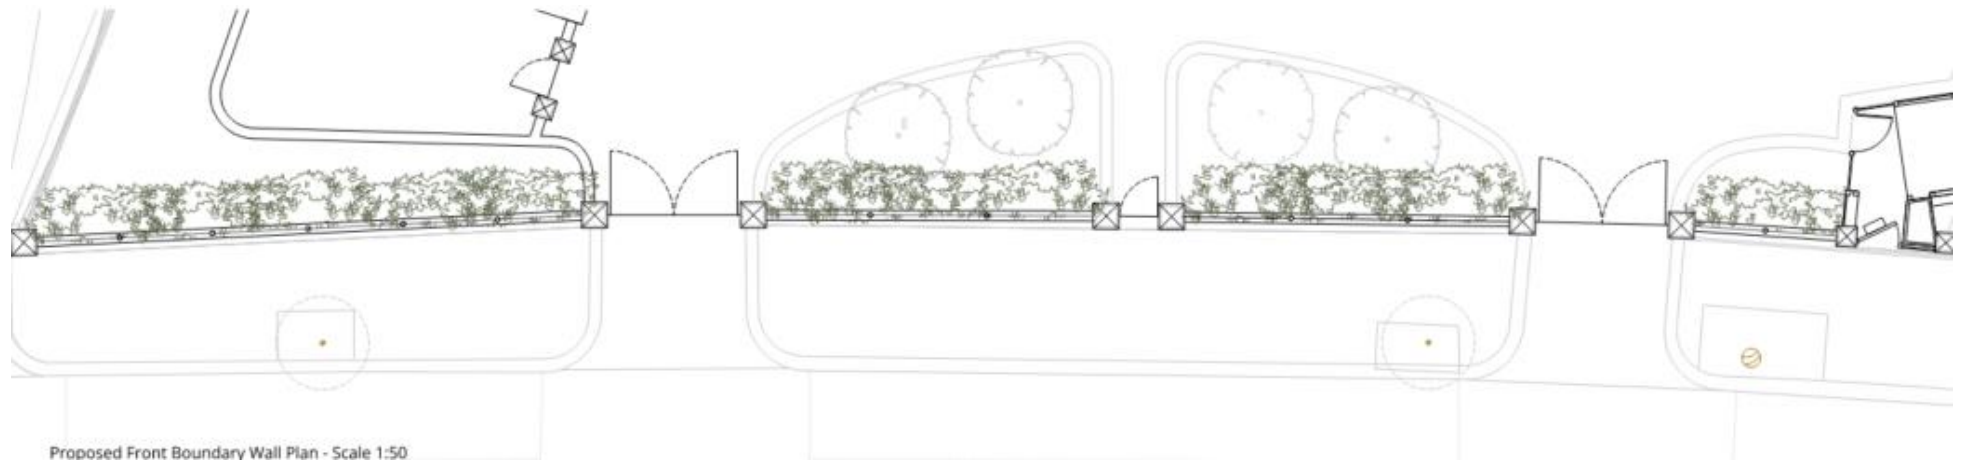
Proposed front boundary wall plan (including side wall to coach house)
